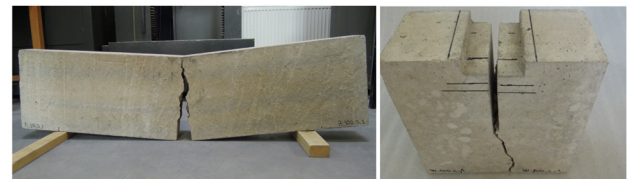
Examples of cracked specimens tested in three-point bending (left) and wedge splitting (right) test configurations.
